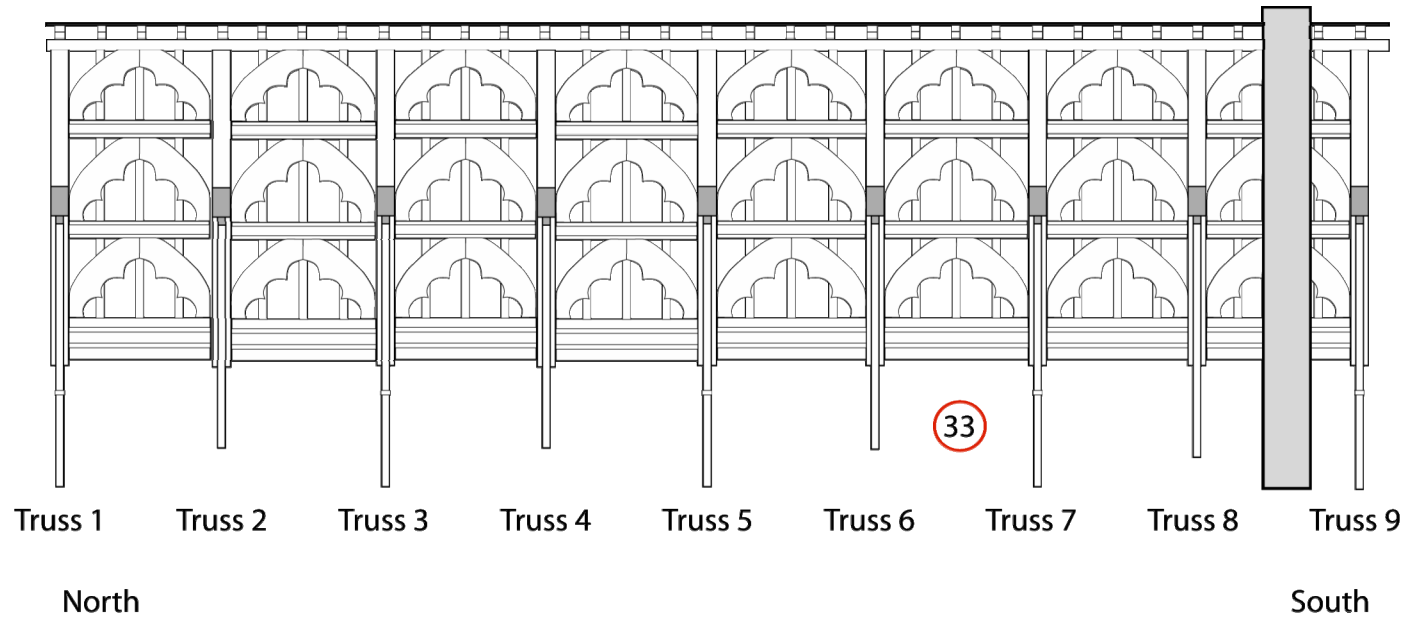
Long section looking east to show sampled timbers (after Marius Barran)
